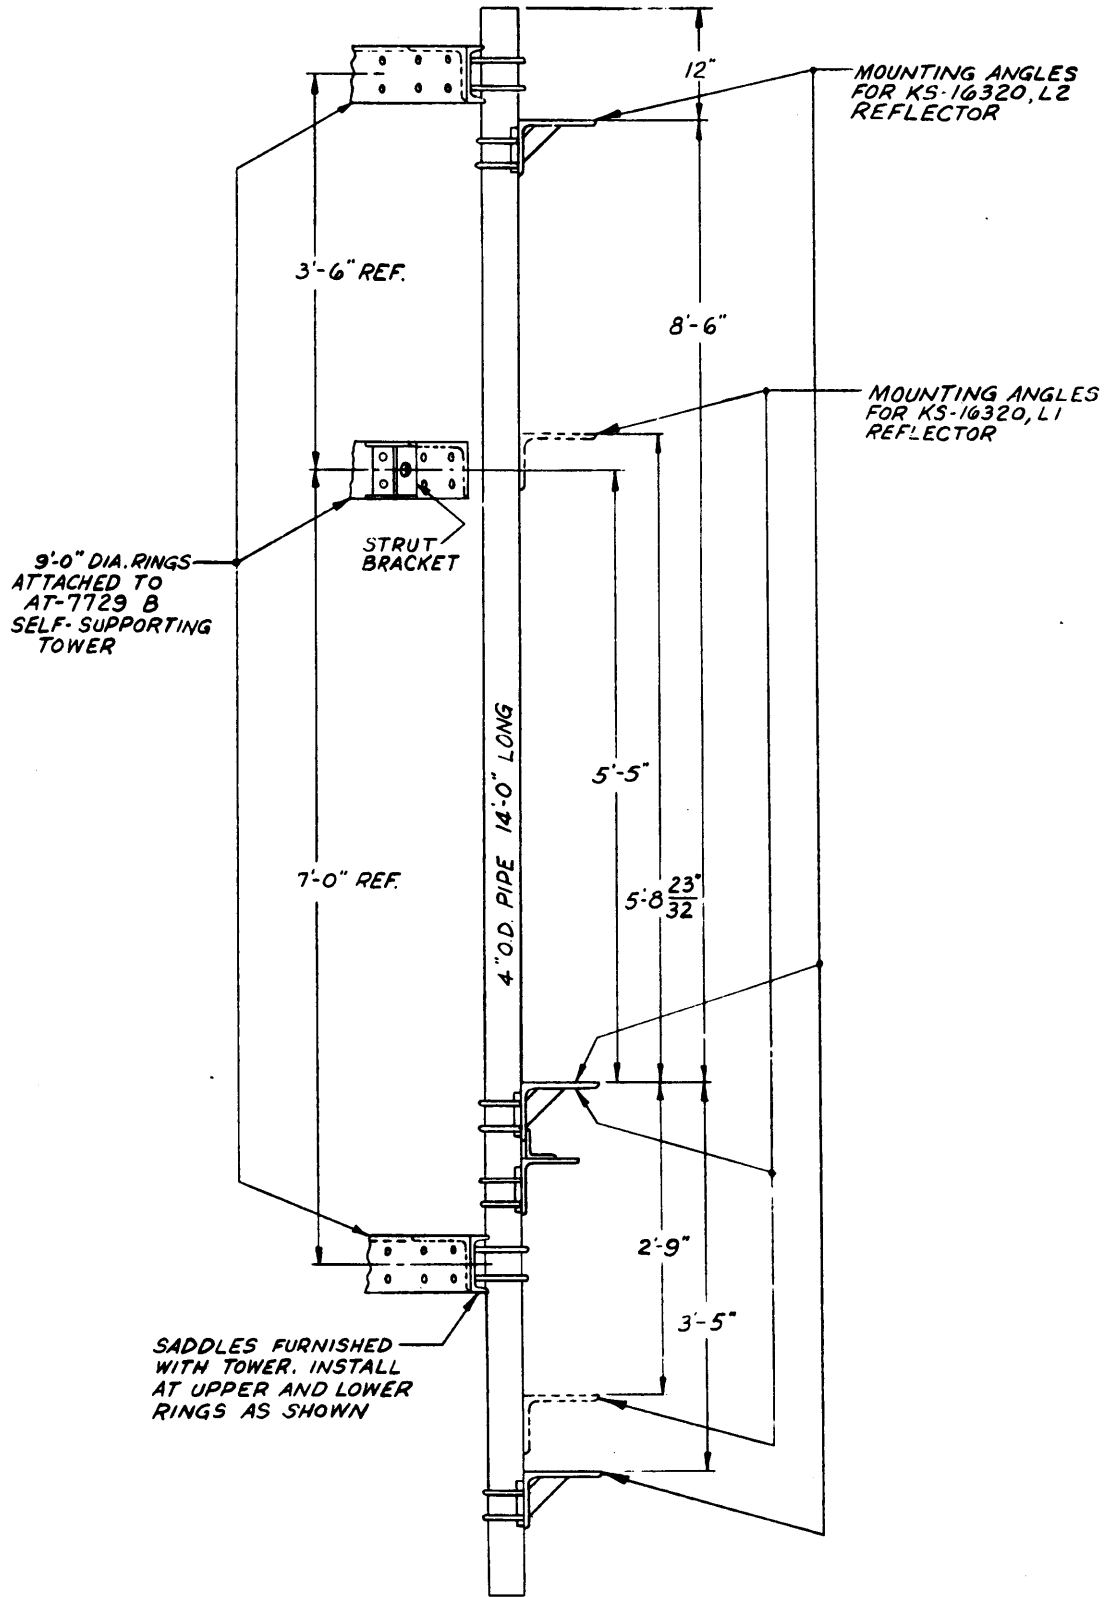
KS-16320 Pipe Mount on AT-7729 B Self-Supporting Tower
